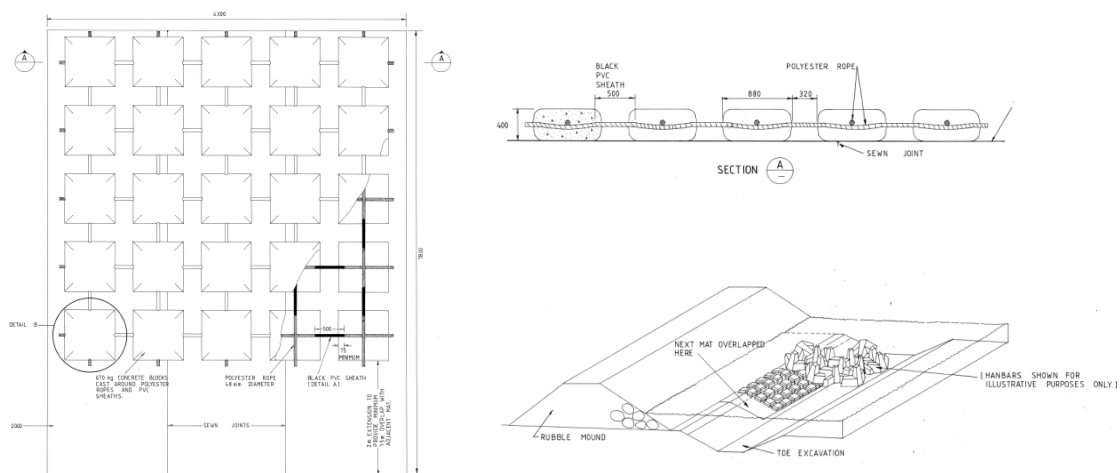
Arrangement of geotextile concrete block mats (*Andrew Dunne*)
